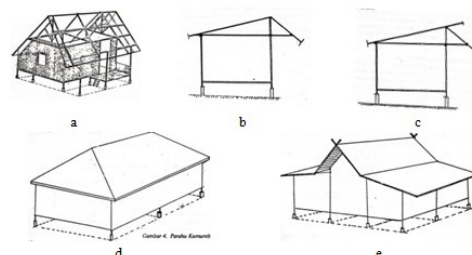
Typical shapes of traditional houses in West Java: a. Suhunan jolopong, b. Tagog anjing, c. Badak heuay, d. Parahu kumureb, e. Julang ngapak
